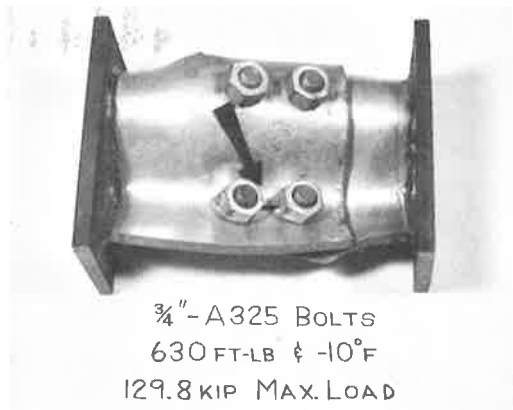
Typical plate failure with crack in plate between bolt holes in lower row.
